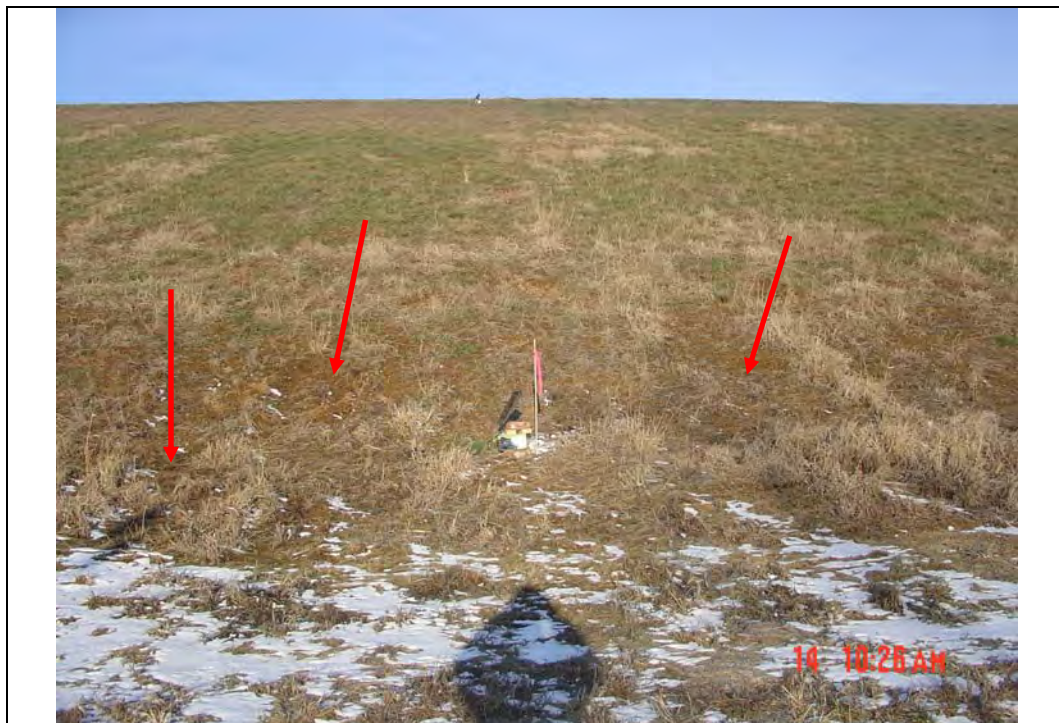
Minor areas of sparse vegetation, south embankment, exterior slope, looking north
